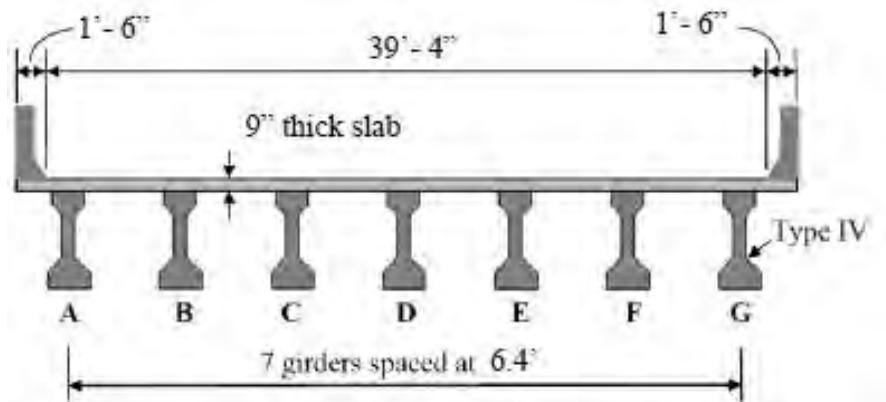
Field Test Bridges (Eamon et al. 2016).
